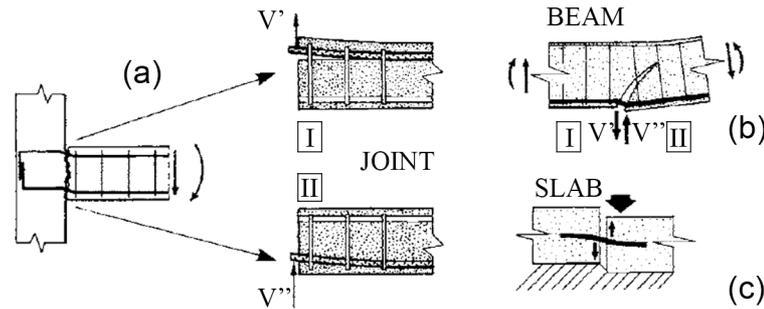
Dowel action in RC concrete elements acting against concrete cover (aI, bI: weak mechanism) and against concrete core (aII, bII, c: strong mechanism); (Dei Poli et al. 1993).
